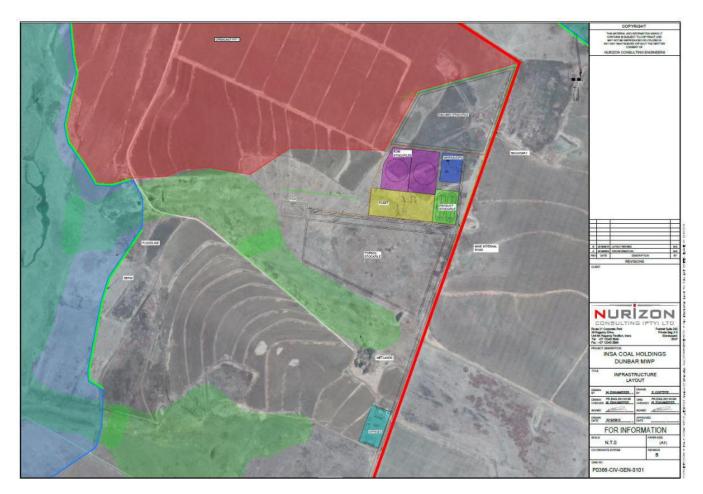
Preferred mining layout for the proposed Dunbar Coal Mine.
